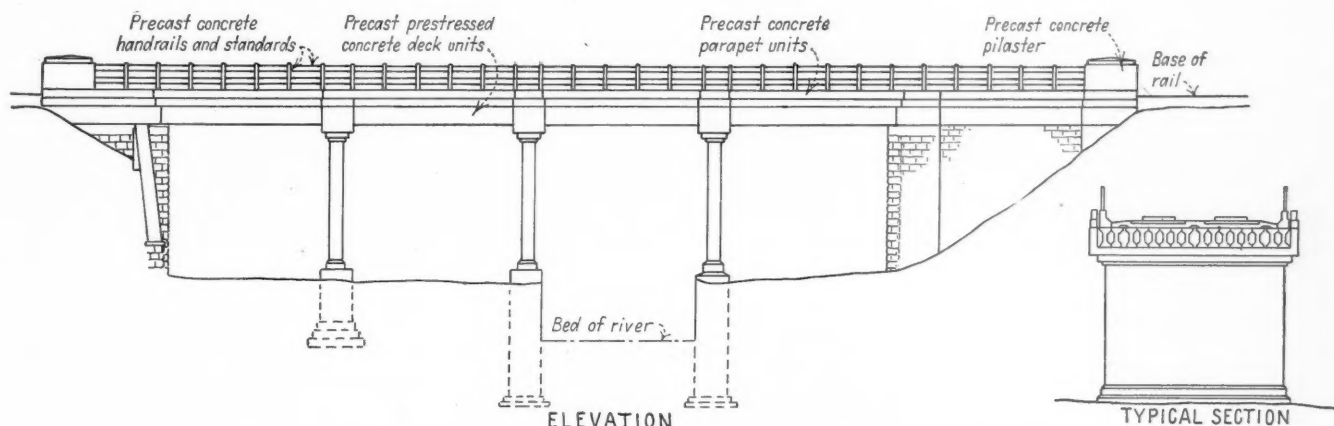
Details of Adam viaduct as reconstructed using a design incorporating prestressed, precast concrete beams
